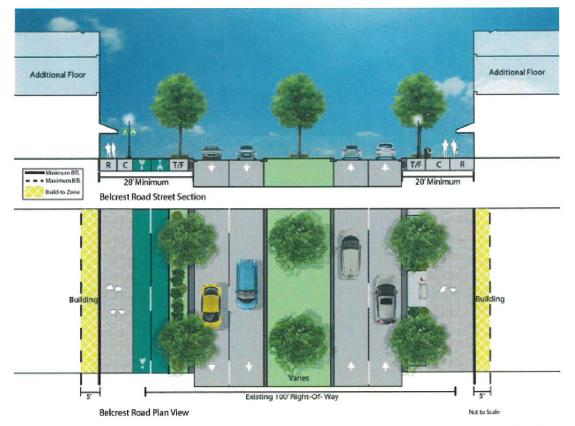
Belcrest Road (Toledo Terrace To Metro Entrance) Illustrative Street Section
